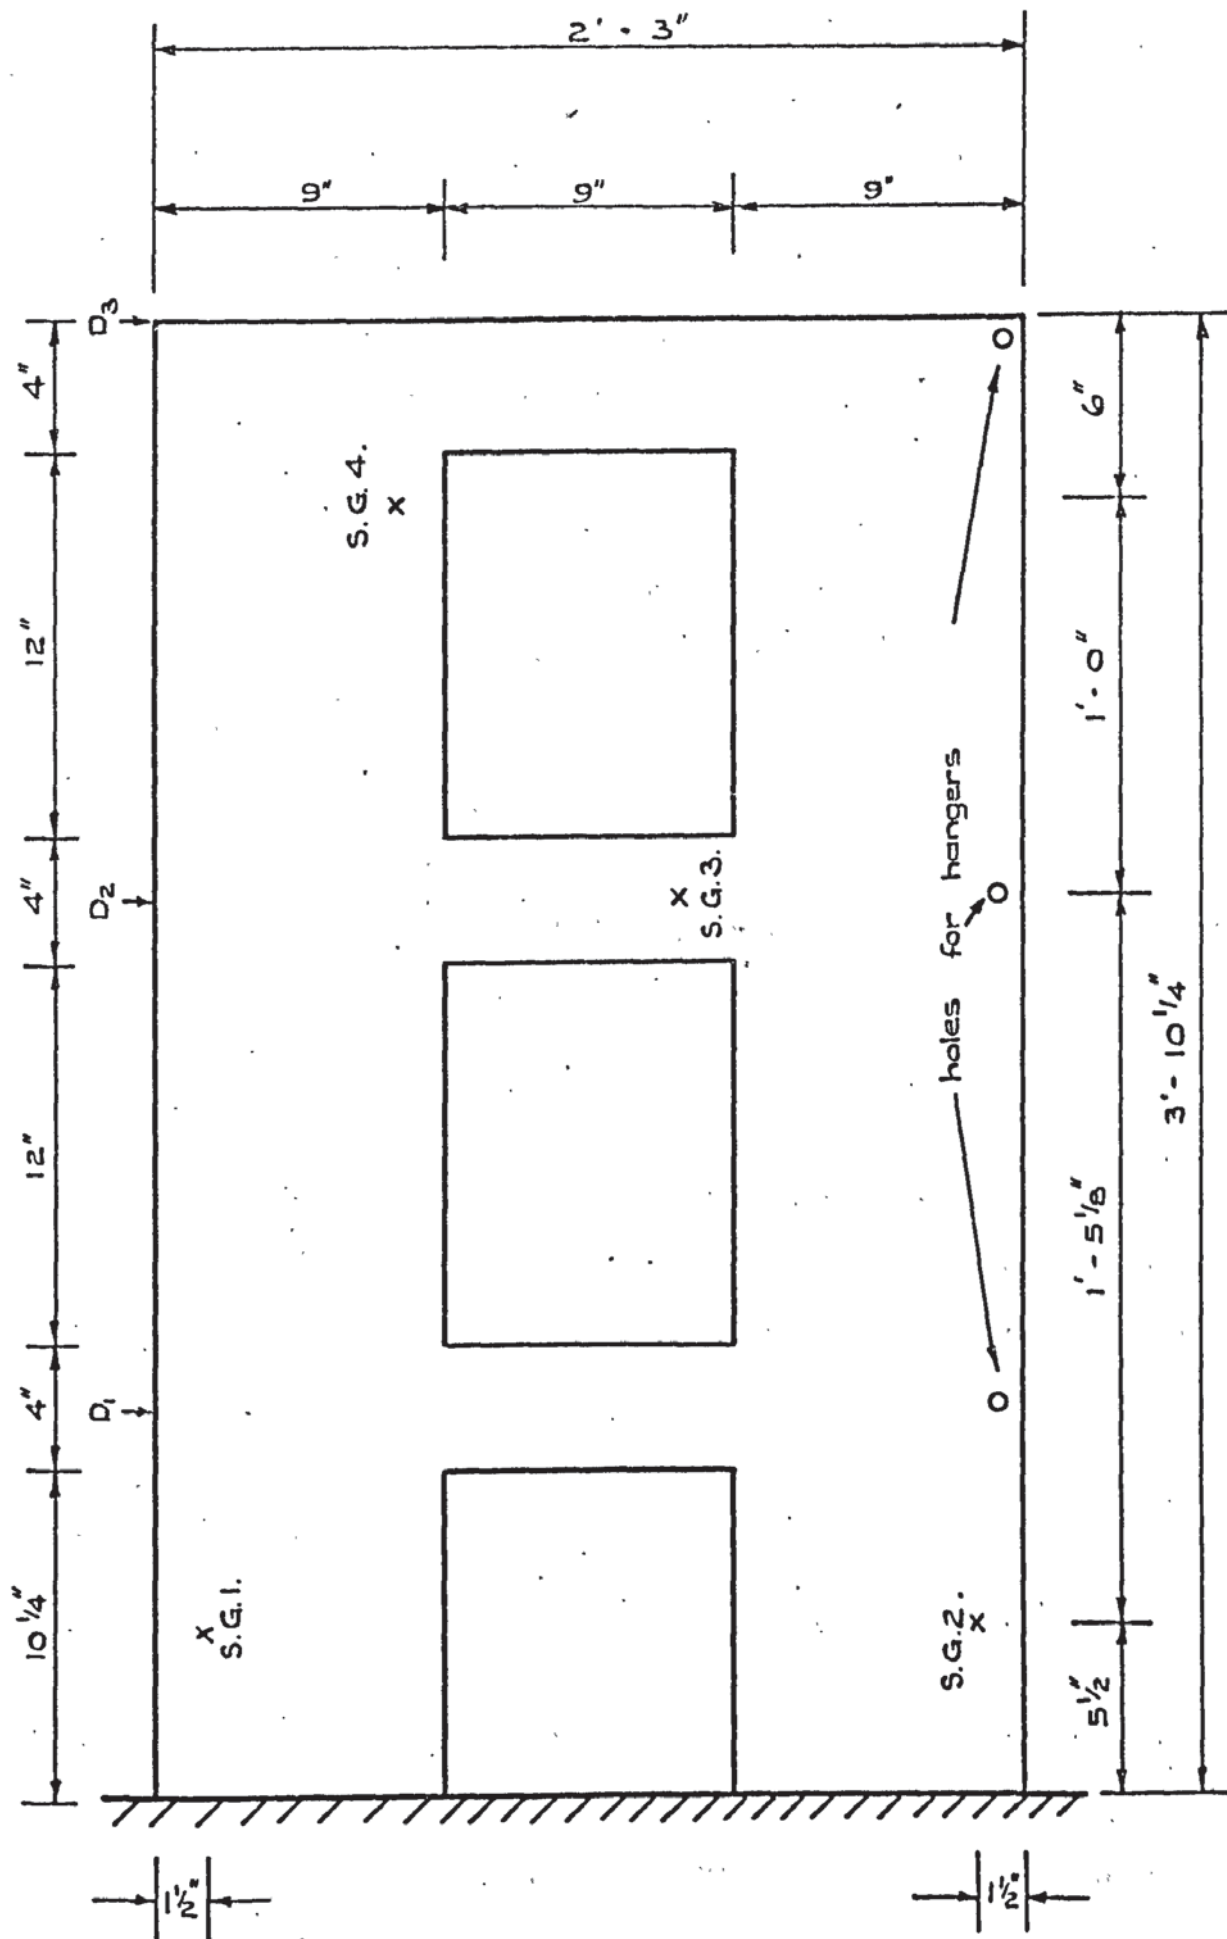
5. DIMENSIONS OF SHEAR WALL
